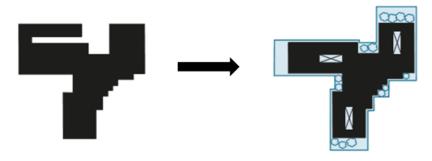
LEFT OLD BUILDING AND RIGHT NEW BUILDING (DE ARCHITECT, 2018)
